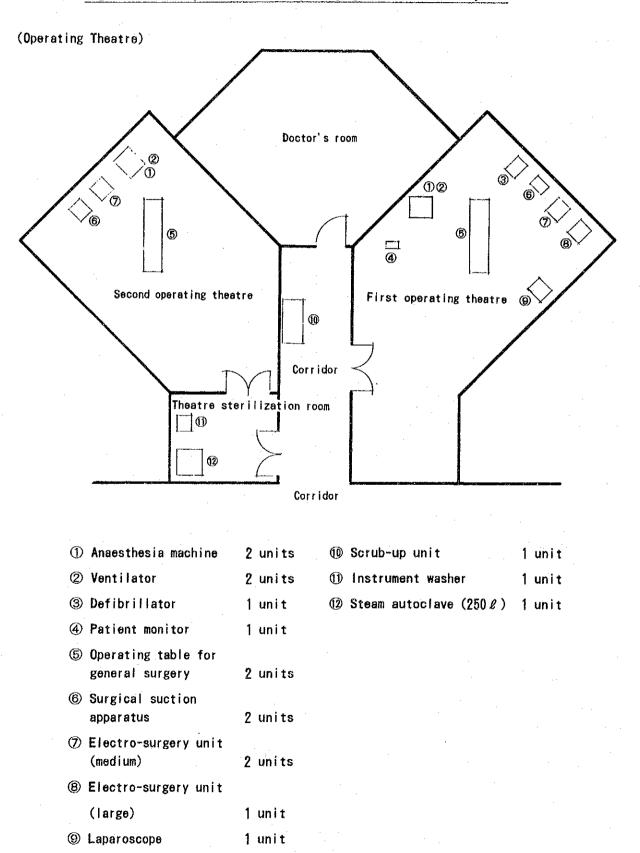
(1) Layout Plan of Major Equipment in Luxor Hospital
